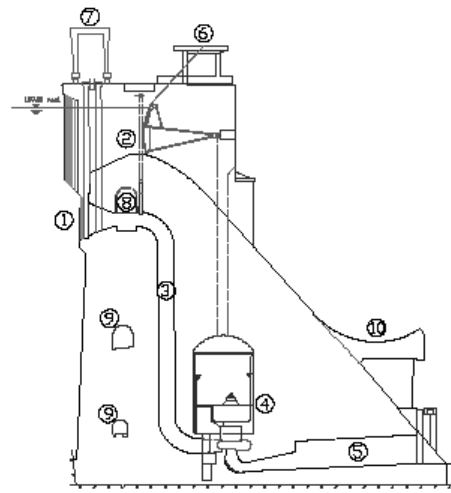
Cross section of Ulza Dam. ①: intake, ②: spillway gate, ③: pressure pipes, ④: power house, ⑤: downstream channel, ⑥: hoisting device, ⑦: gantry crane, ⑧: valve chamber, ⑨: control galleries, ⑩: flip bucket.
